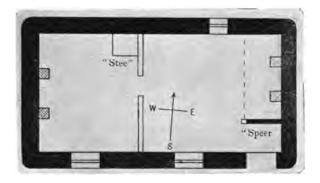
Mud-walled house, still standing at Great Hatfield, England. The walls are two feet thick. The "speer" is a screen, protecting from drafts; the "stee" is the ladder to the upper story.
